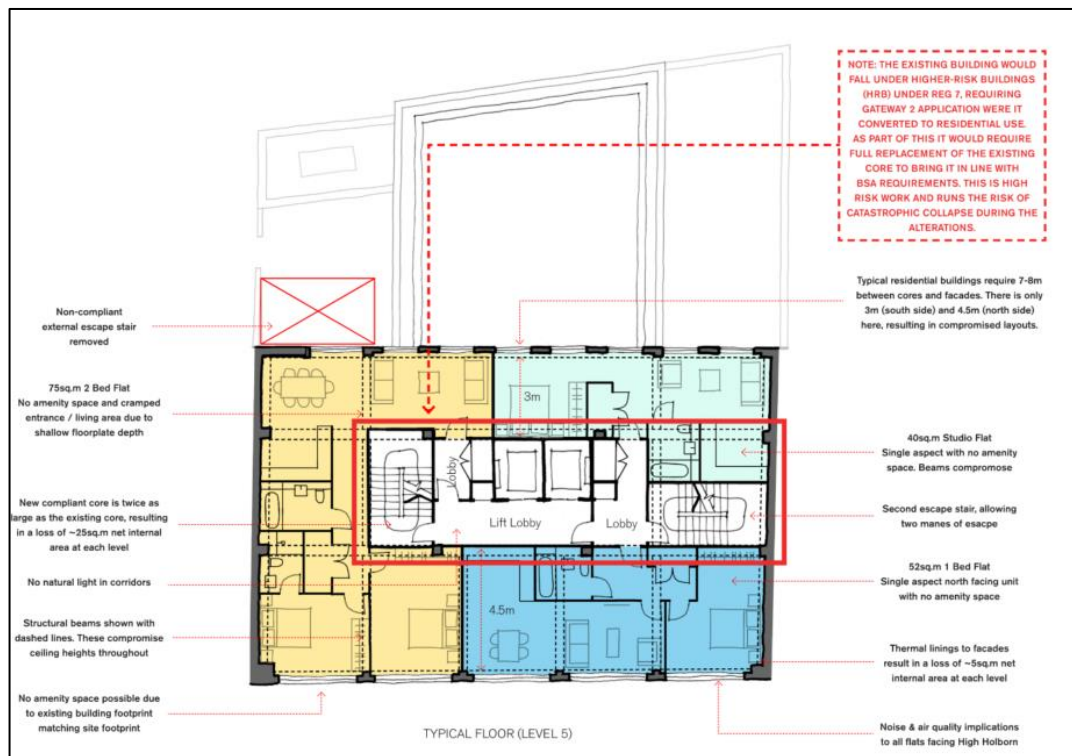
Issues associated with providing residential on-site (Source: Design and Access Statement, Section 4.3)
